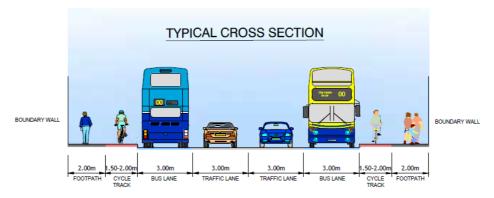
Typical Cross Section with Cycle Route Option B at Clanbrassil Street Upper
